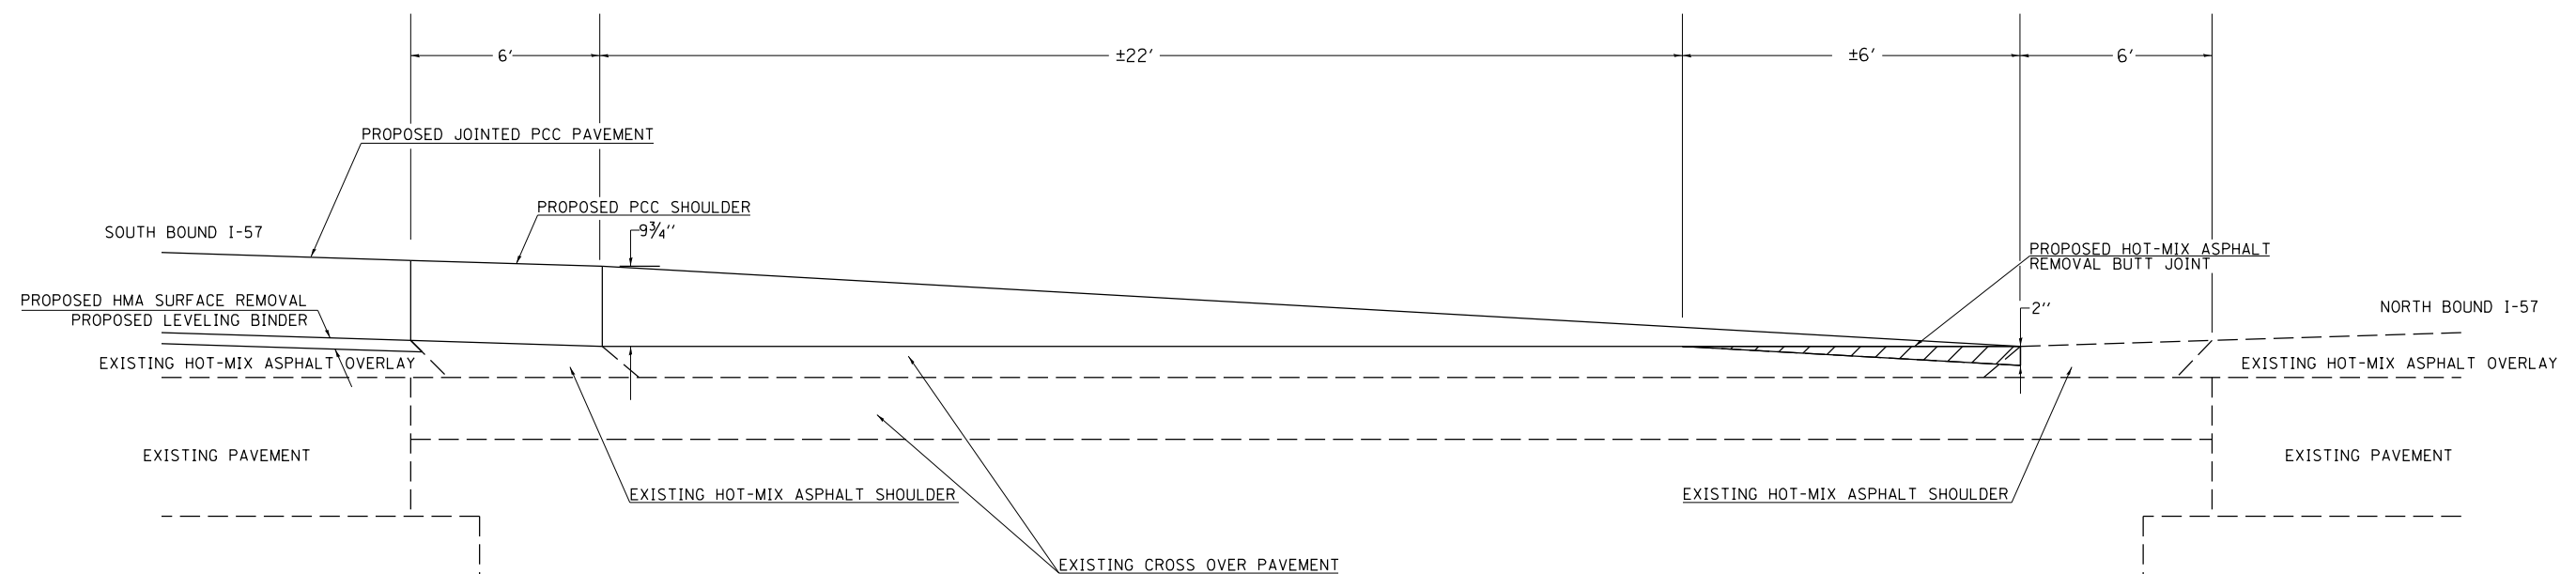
DETAIL OF MEDIAN CROSSOVER PLAN VIEW
